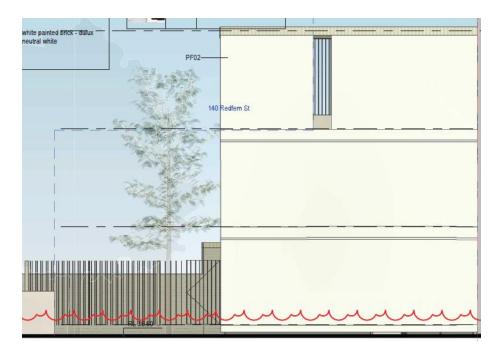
Secondary dwelling west elevation, presented at 1 November 2023 LPP Meeting
